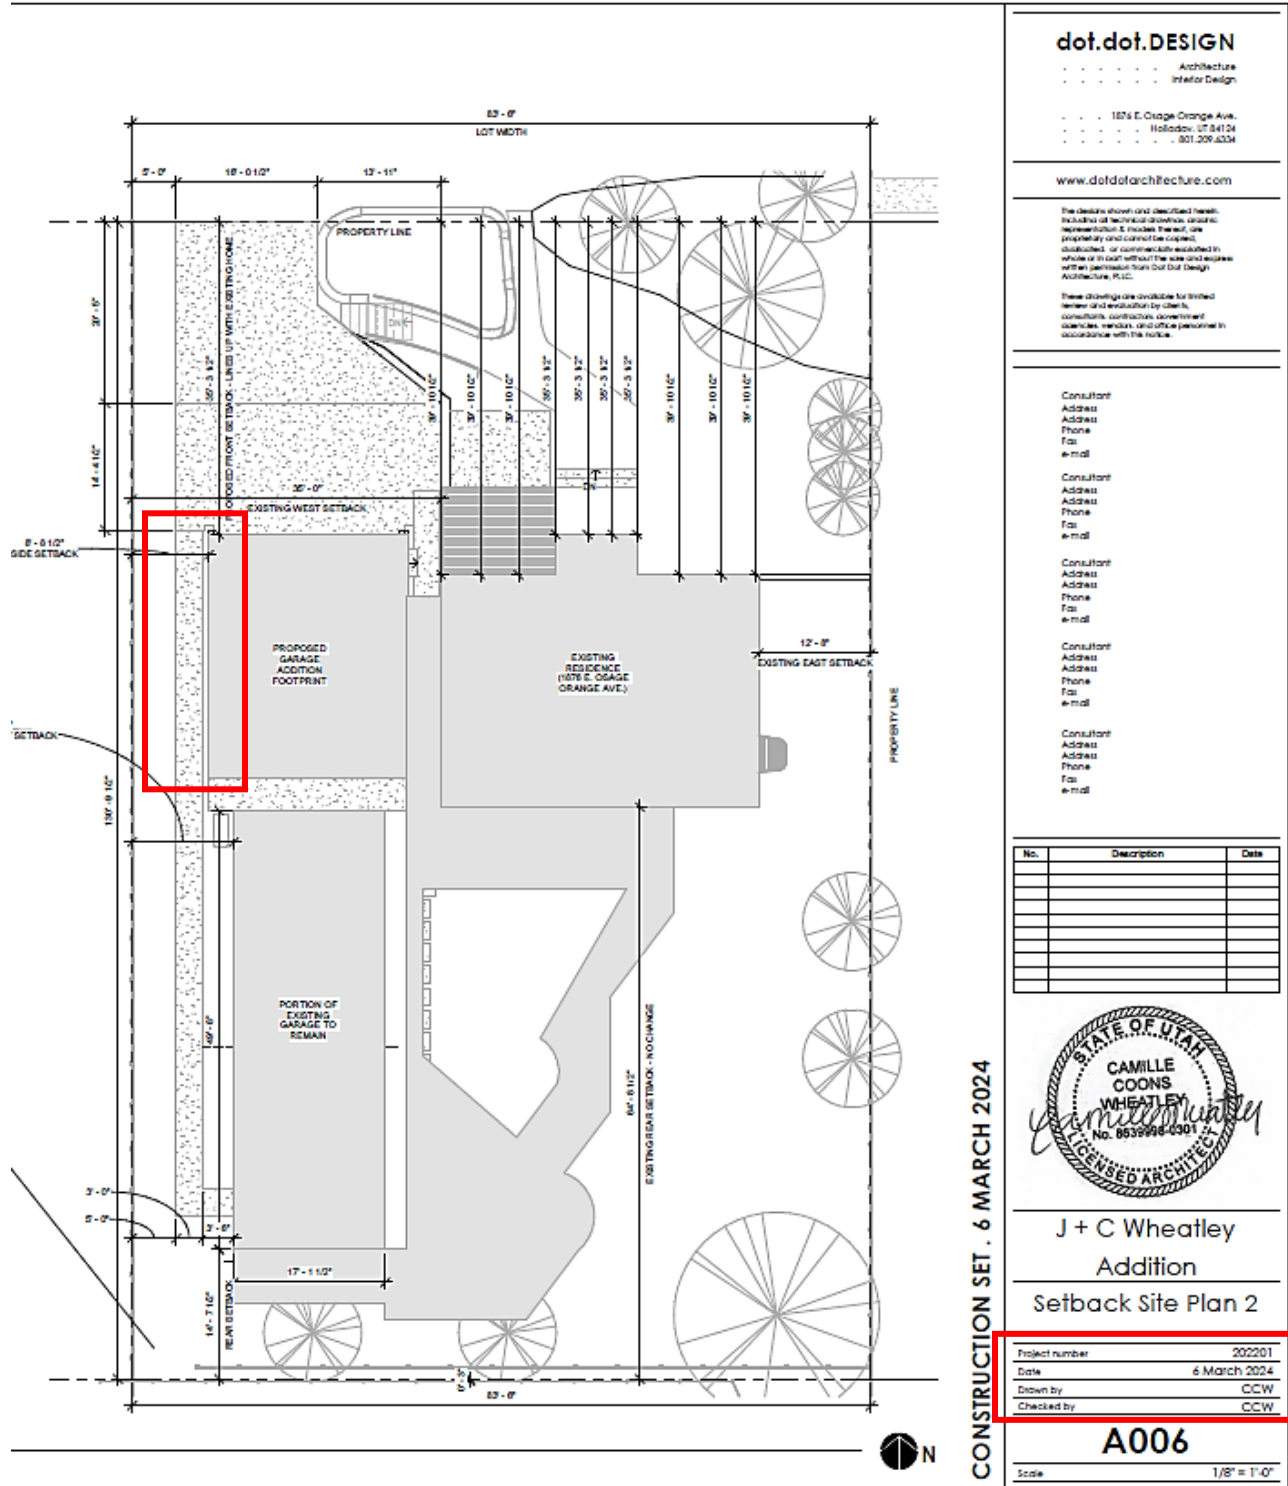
Revised Compliant Site Plan Submitted by Applicant (3/6/2024)
